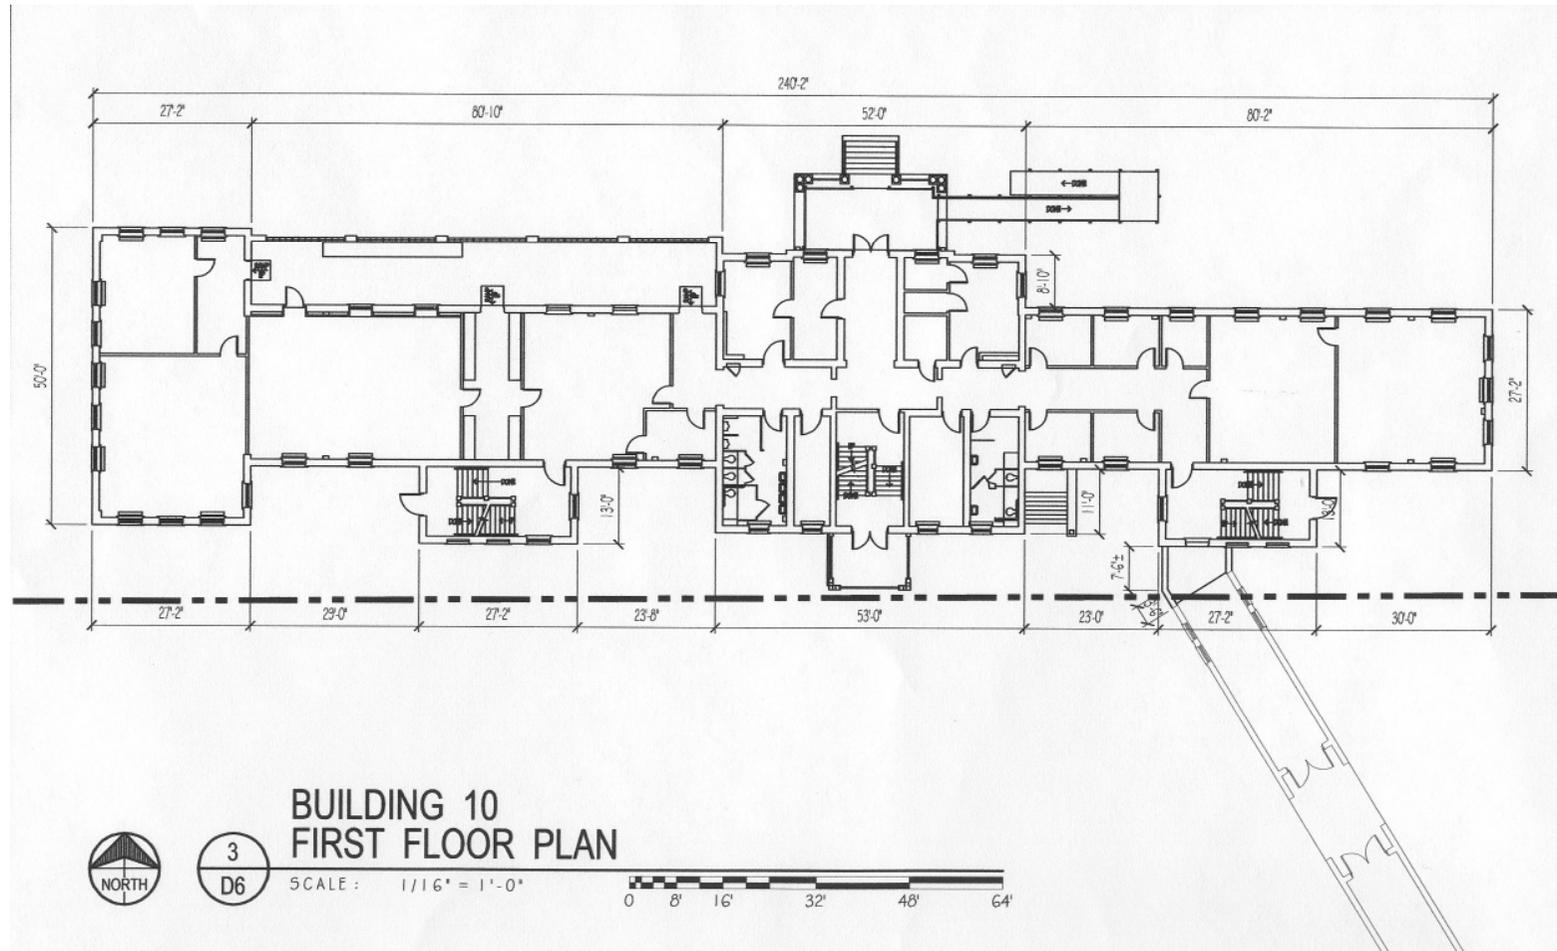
First-story plan of Building 10, showing existing conditions (Walton and Associates 2003).
